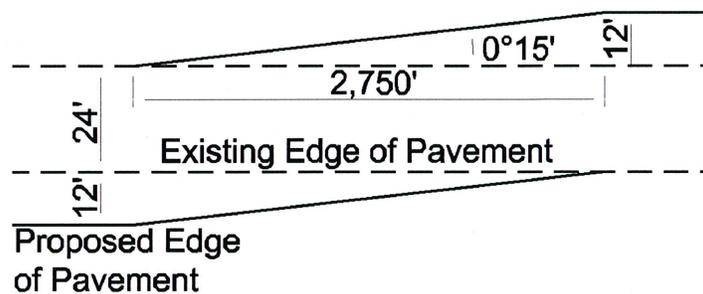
PAVEMENT TRANSITION DETAIL
